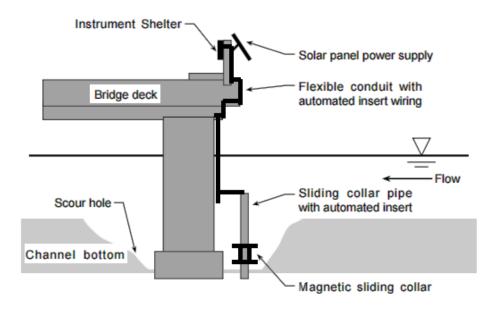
Sliding Magnetic Collar Installed at Bridge Pier Source: Haas et al. (1999); adapted from NCHRP Report 21-3
